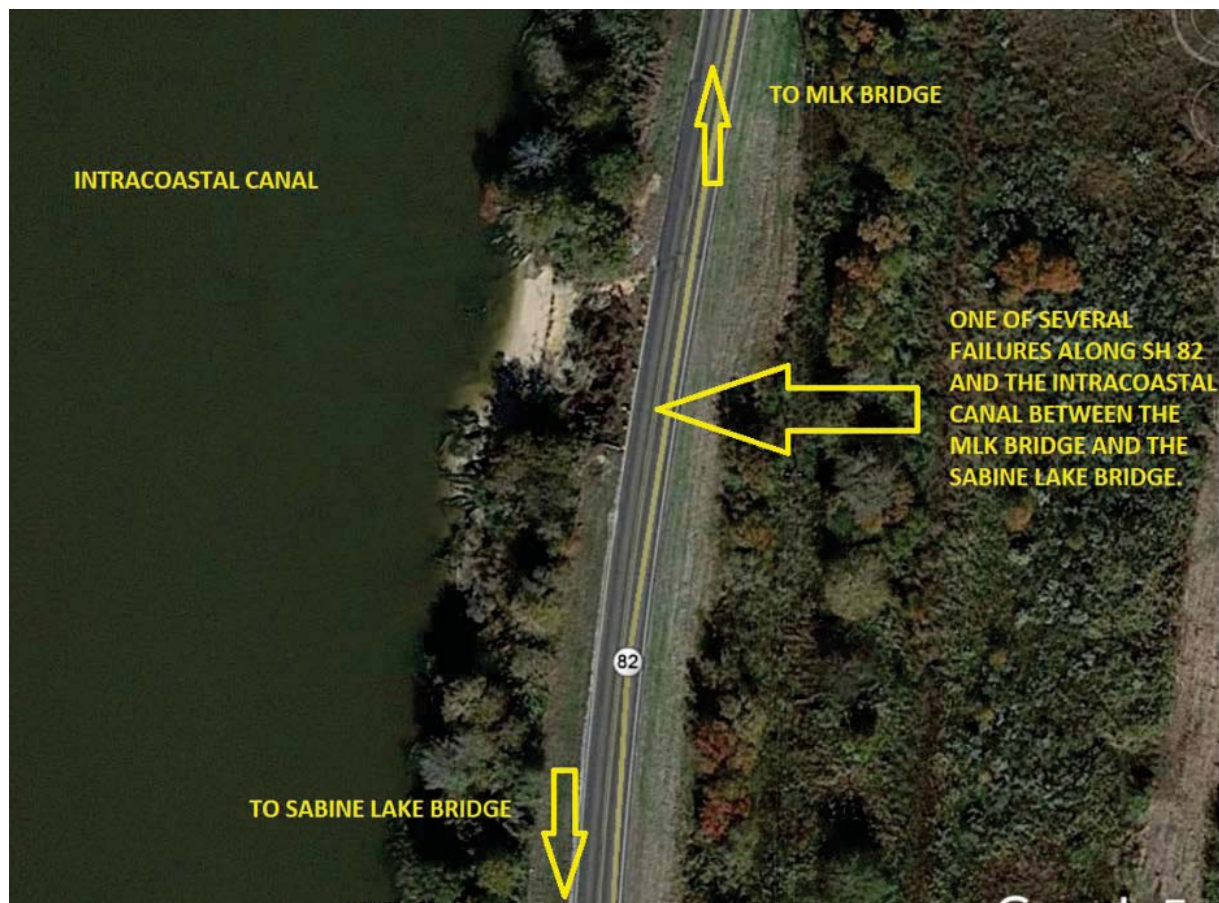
Pavement Failure due to Hurricane Harvey
